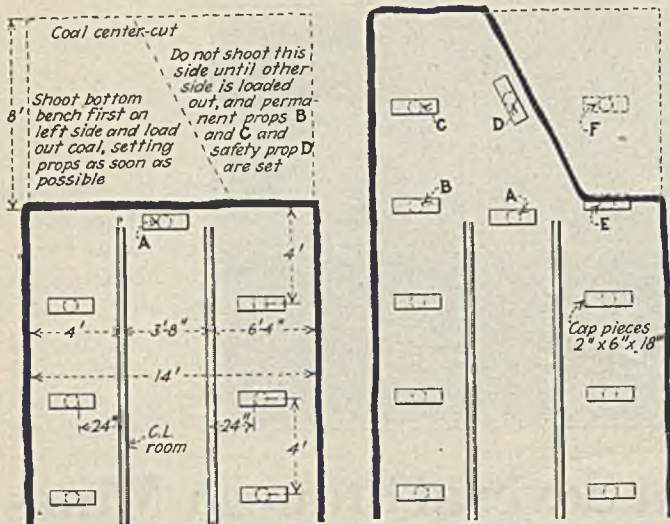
Loading Out and Timbering a Center-Cut in Room
